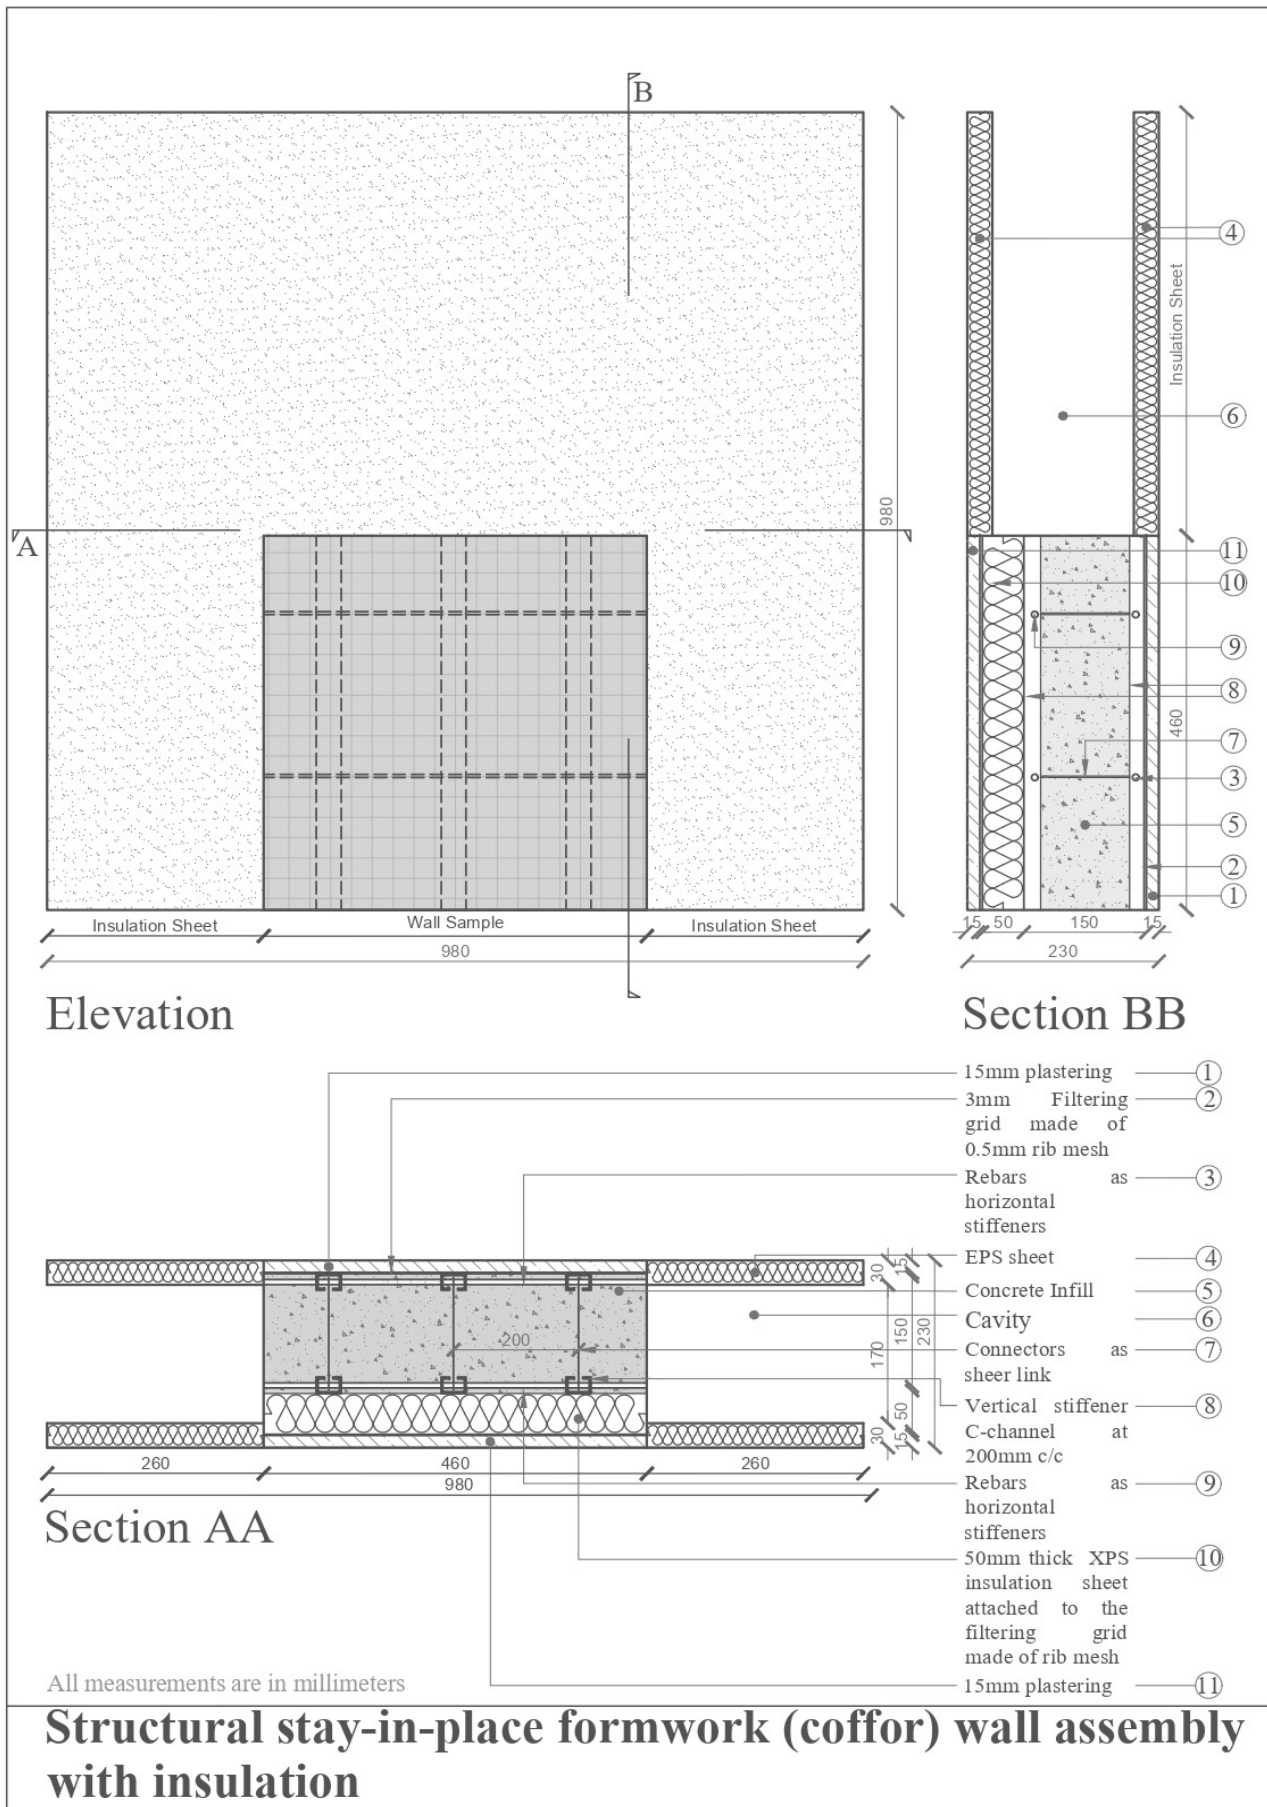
Schematic drawing of Structural Stay-in-Place Formwork (Coffor) wall sample with insulation as per specifications found in BMTPC Performance Appraisal Certificate (PAC) no: 1035-S/ 2018.
